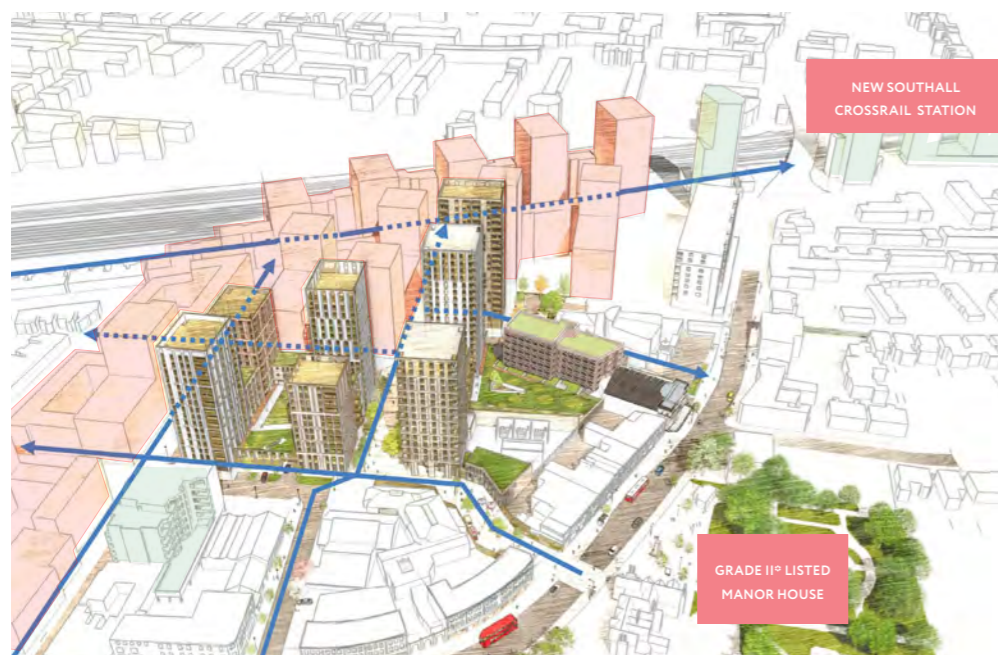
SKETCH STUDY OF THE WIDER MASTERPLAN
